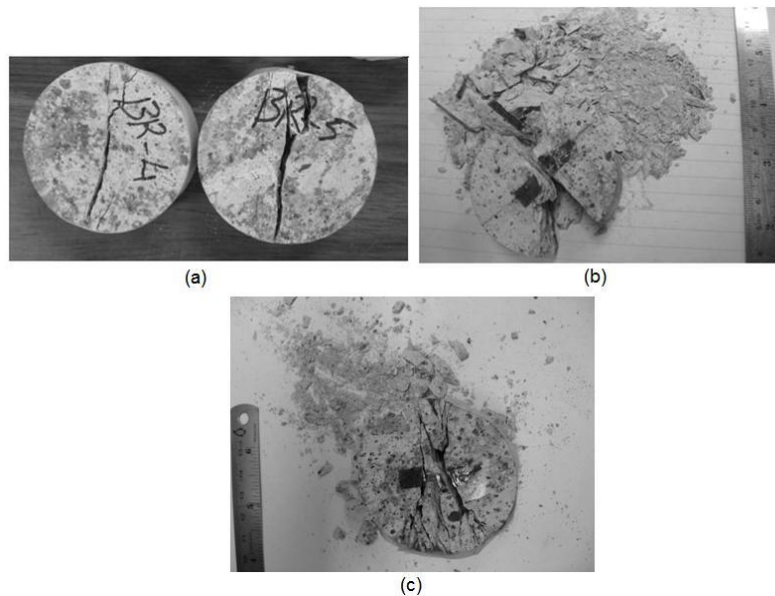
Tested Brazilian disc specimens under (a) static loading, and (b) and (c) cyclic loading
